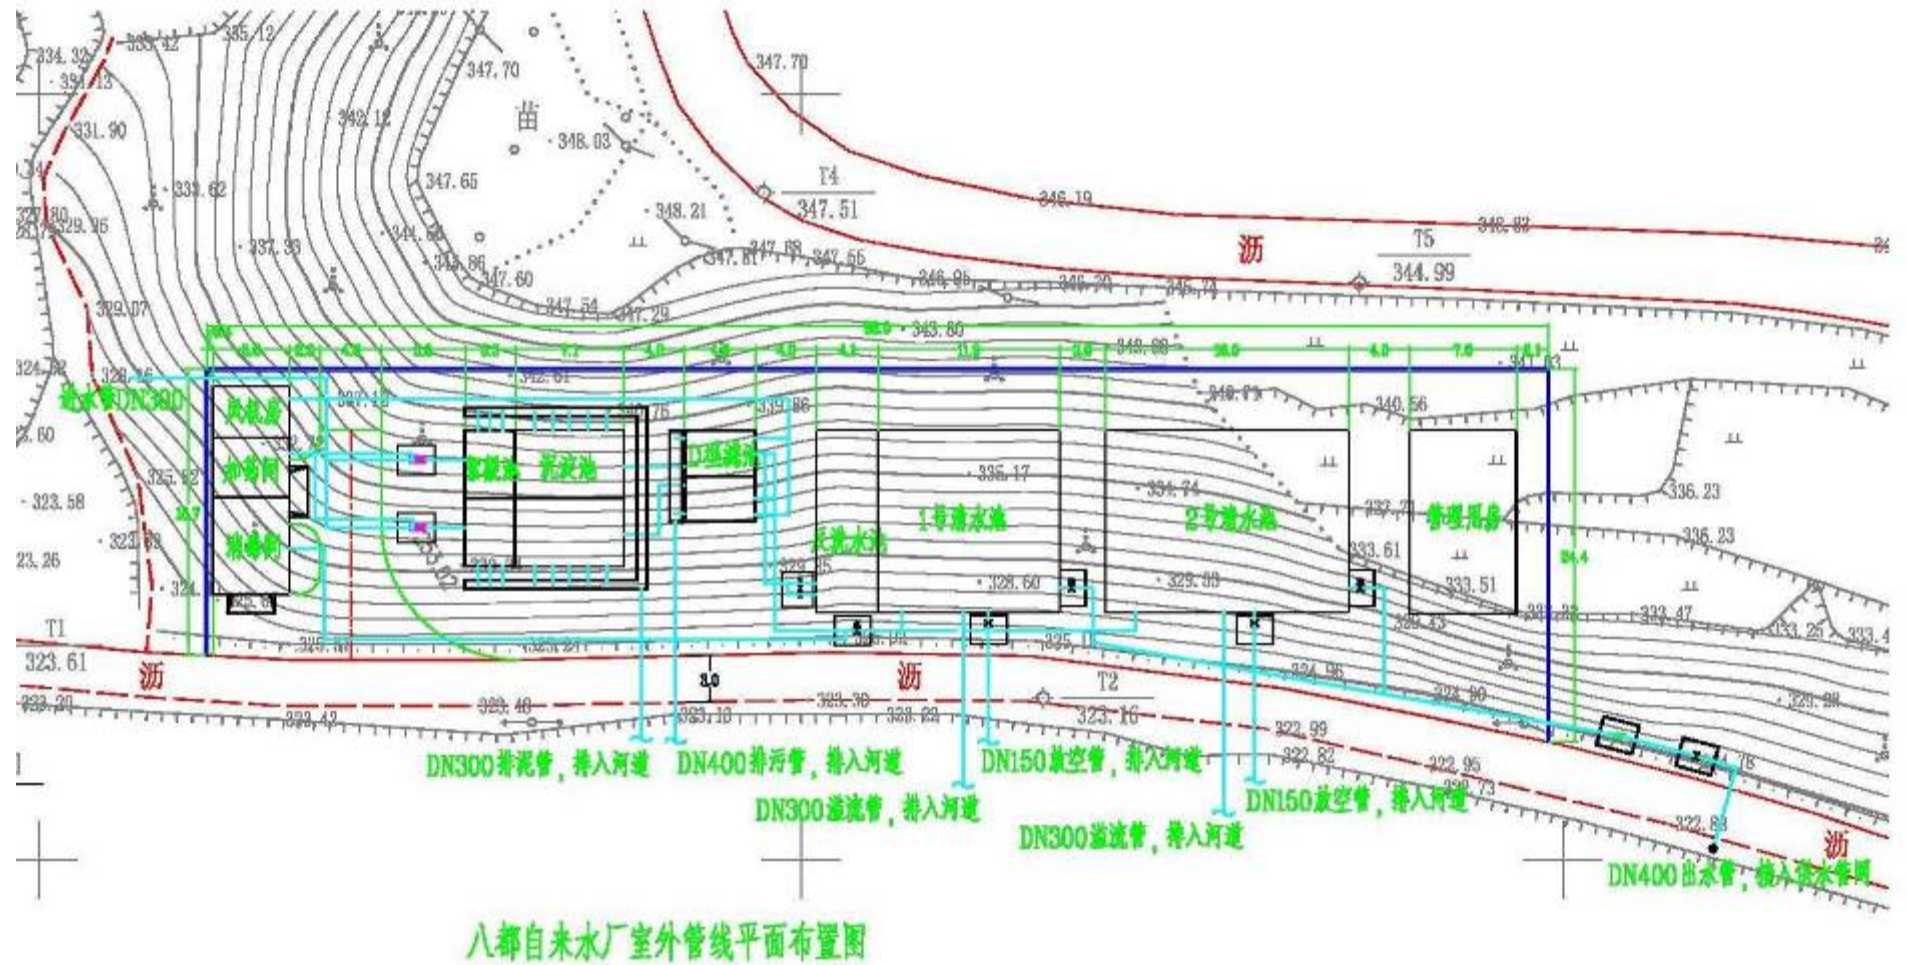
Plant Area Arrangement Plan of Water Plant of Badu Town, Longquan City
